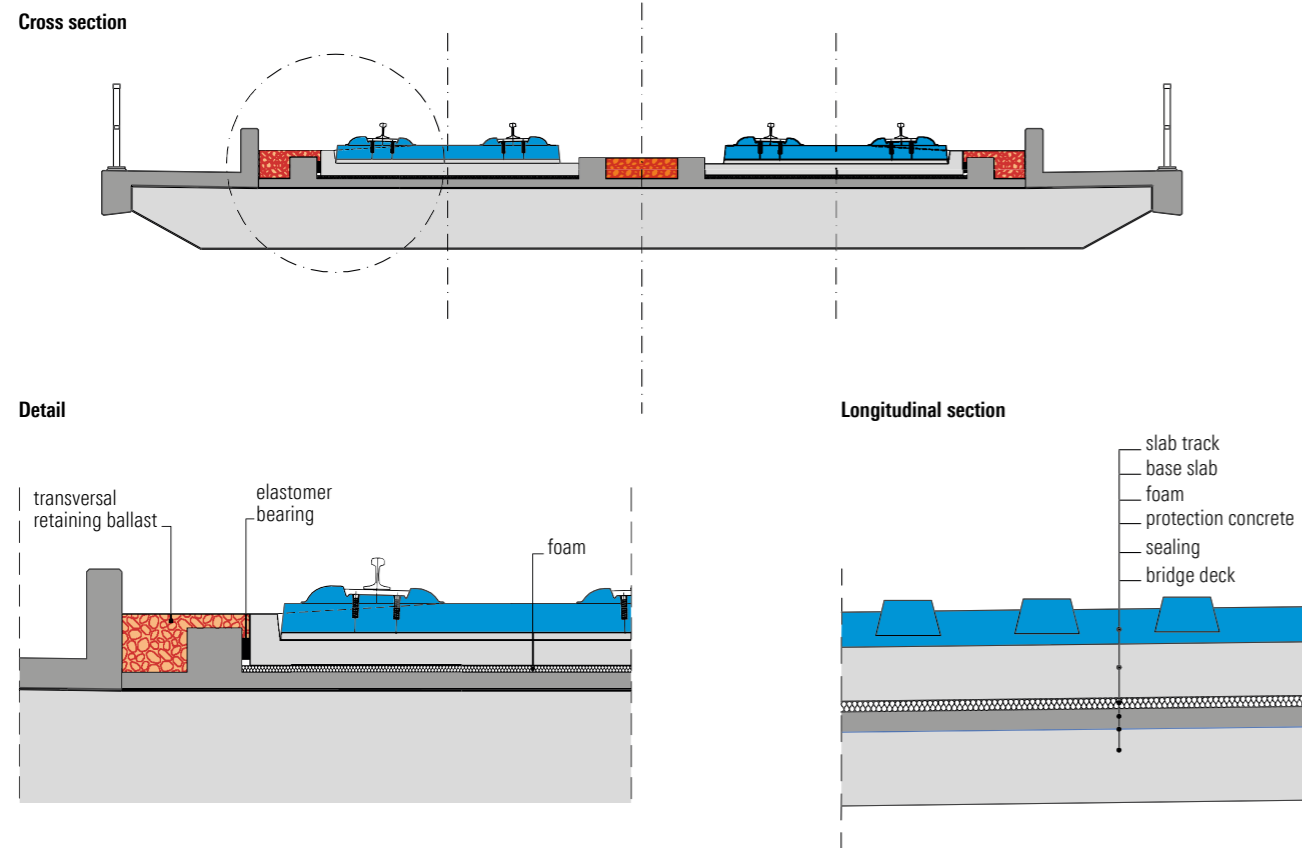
Typical layout of the slab track for a short bridge (<25 m)
